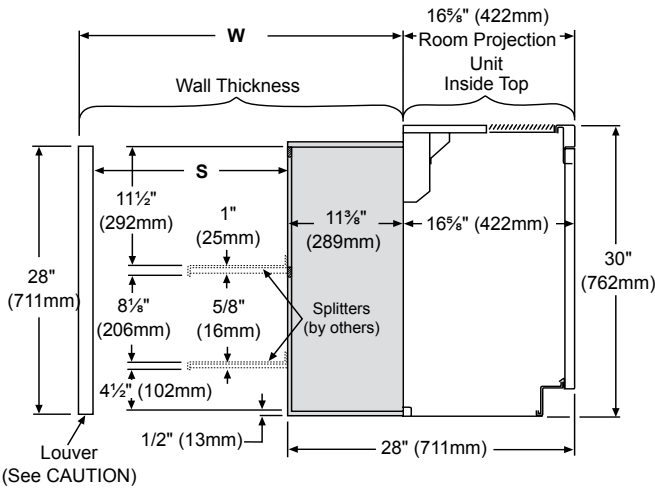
16 5/8 inch Room projection or full wall sleeve recess
